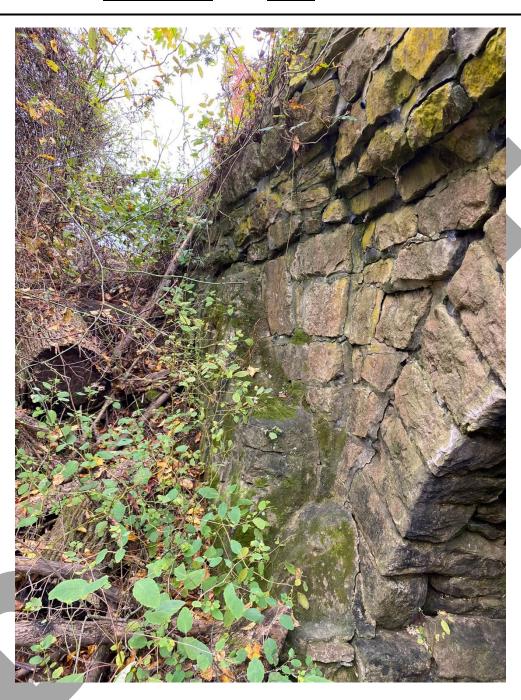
Northeast (upstream) side of the bridge, view facing south showing buttress at the base of the northeast wingwall, the arch ring, spandrel, and the displaced parapet.
